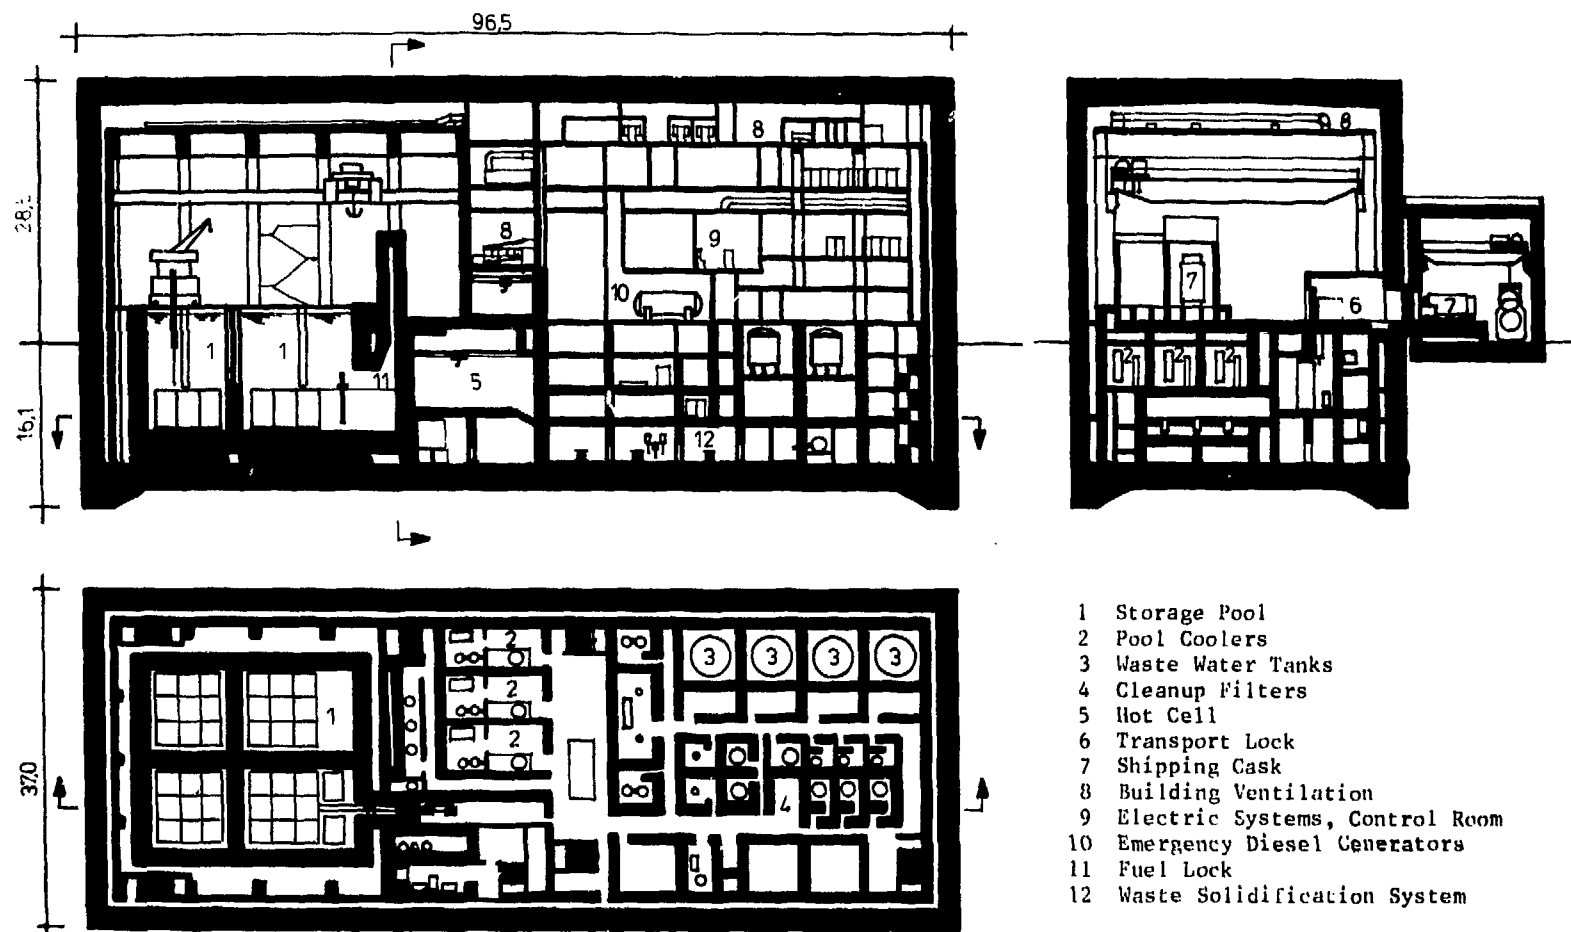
PLAN VIEW AND SECTIONS OF AN INDEPENDENT SPENT FUEL STORAGE FACILITY FOR CENTRAL EUROPE (DESIGN: BBC-MANNHEIM)
